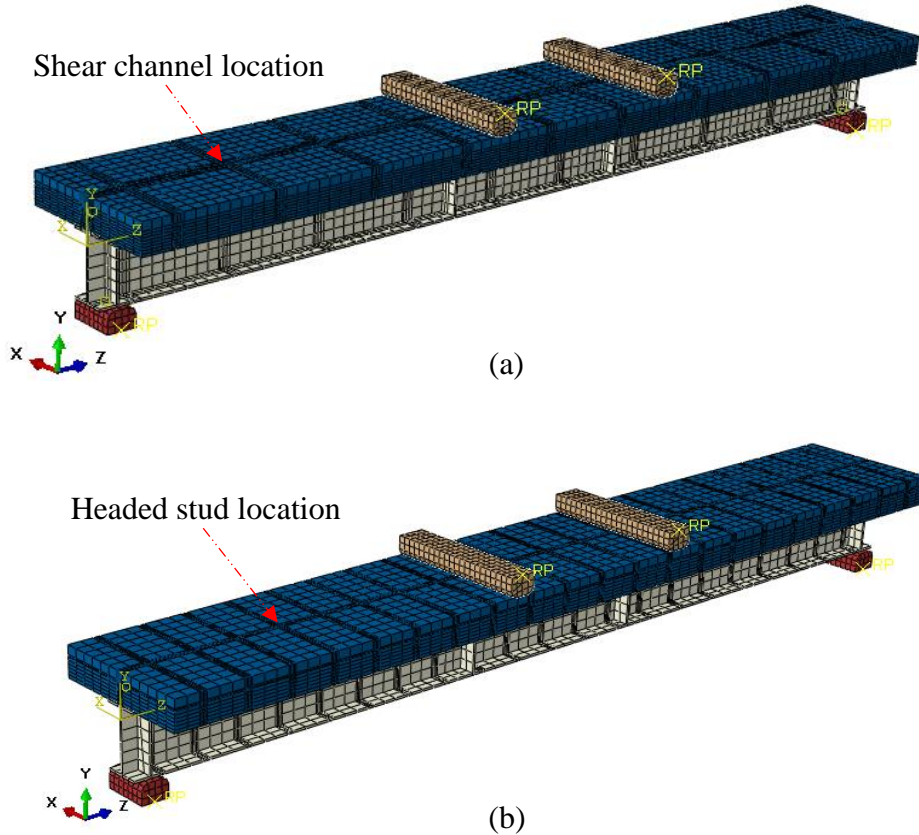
Finite element mesh: (a) Shear channel beam (b) headed stud beam.
